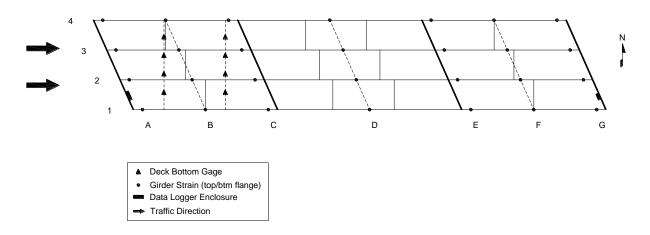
Plan view of the layout of strain sensors on the steel superstructure elements and sensors on the bottom of the concrete deck
